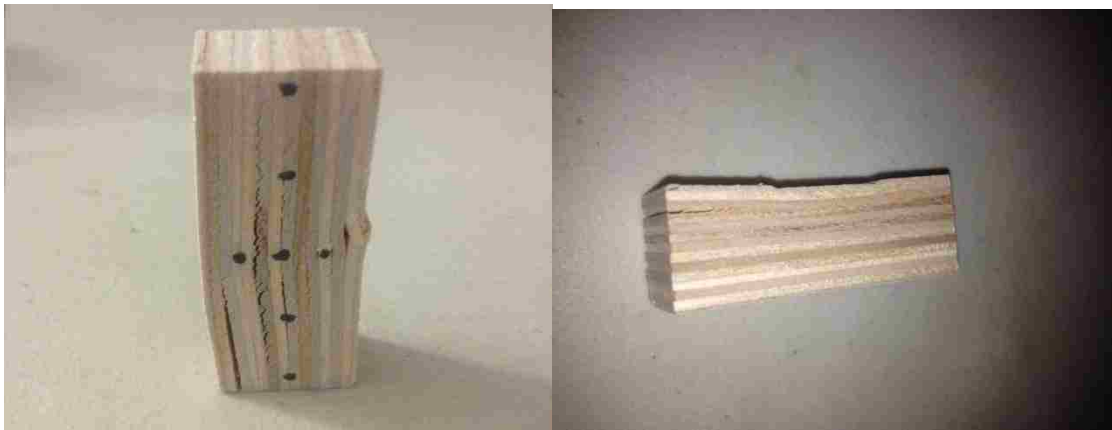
Figure I. Failed Specimen in Compression Parallel Test (Left), Perpendicular Test (Right).
